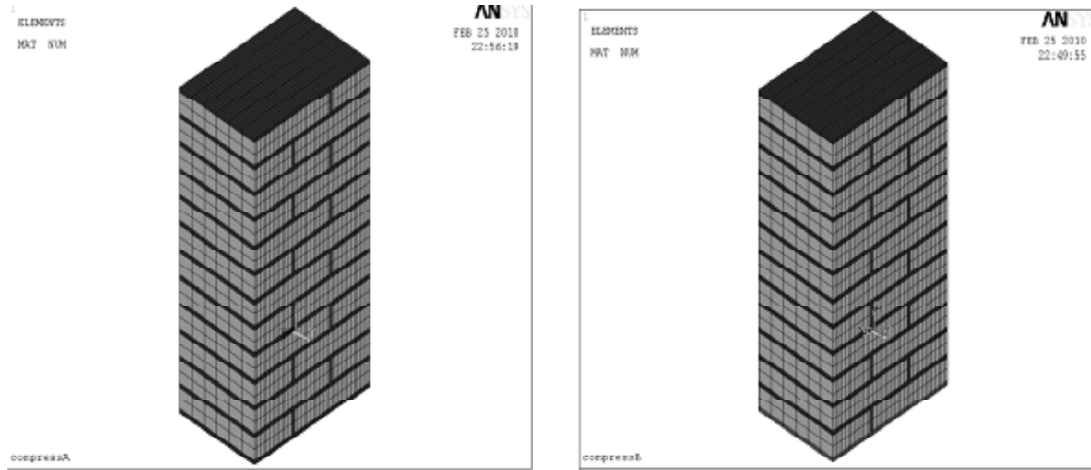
Compressive Specimens Mesh of Original (left) and with Grouting Strengthening (right)
